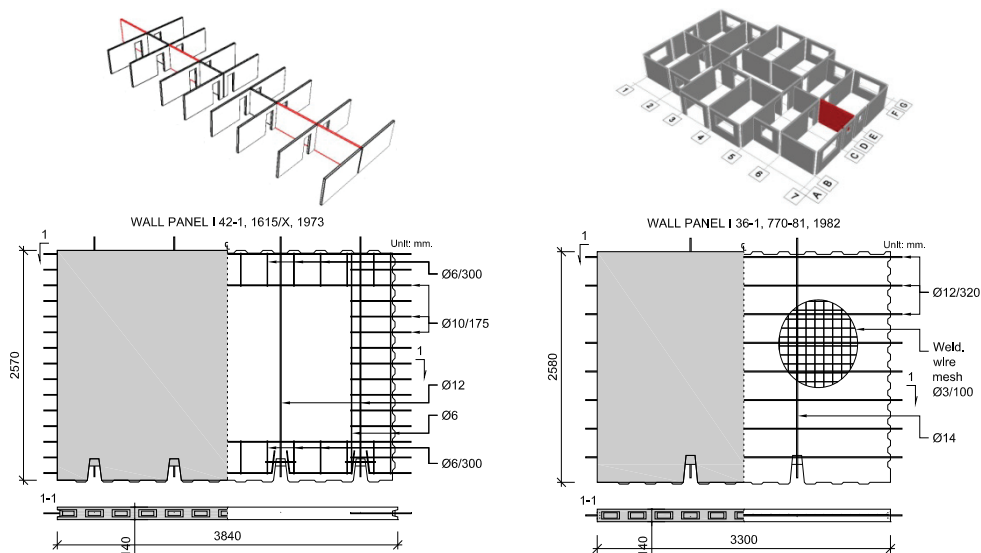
Concrete outlines and reinforcement of the I 42-1 and I 36-1 walls
